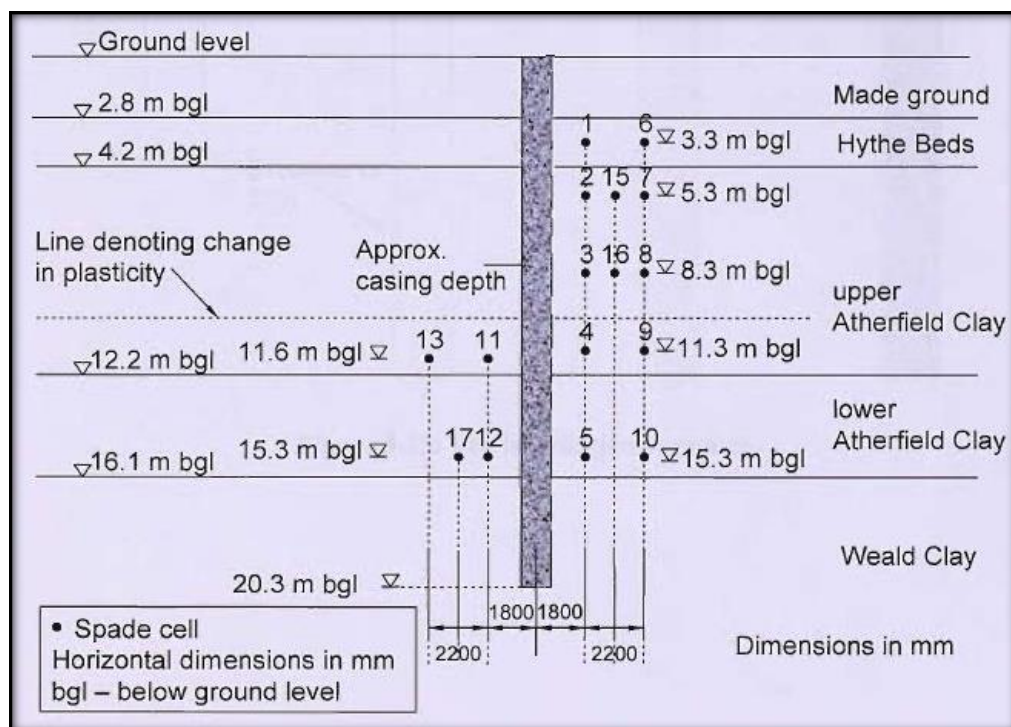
Elevation of instrumented section at CTRL, Ashford (From Clark, 2006).
